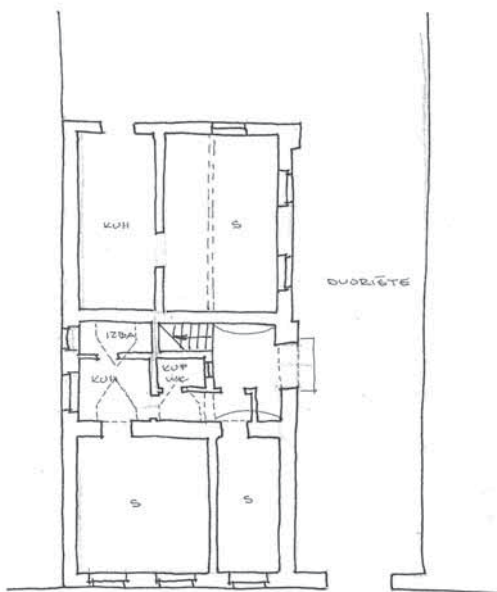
Vranicanijeva 6, Hubman House, ground floor plan (MK-UZKB-KOZ)
